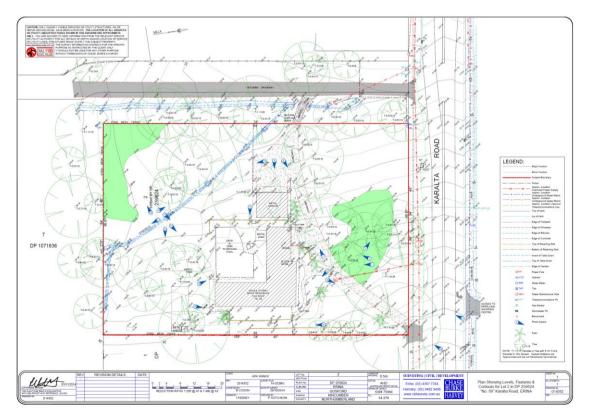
Site Survey Plan – Lot 1 in DP259824 (image courtesy of Chae Burke Harvey)
